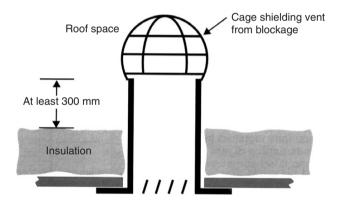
Ventilator used in a roof space (e.g. a loft)
